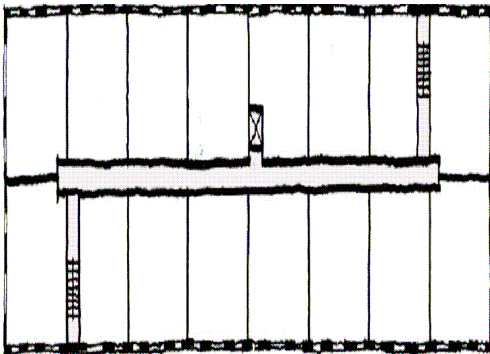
Double –Loaded corridor Apartment building (Courtesy- Old Castle Co.
